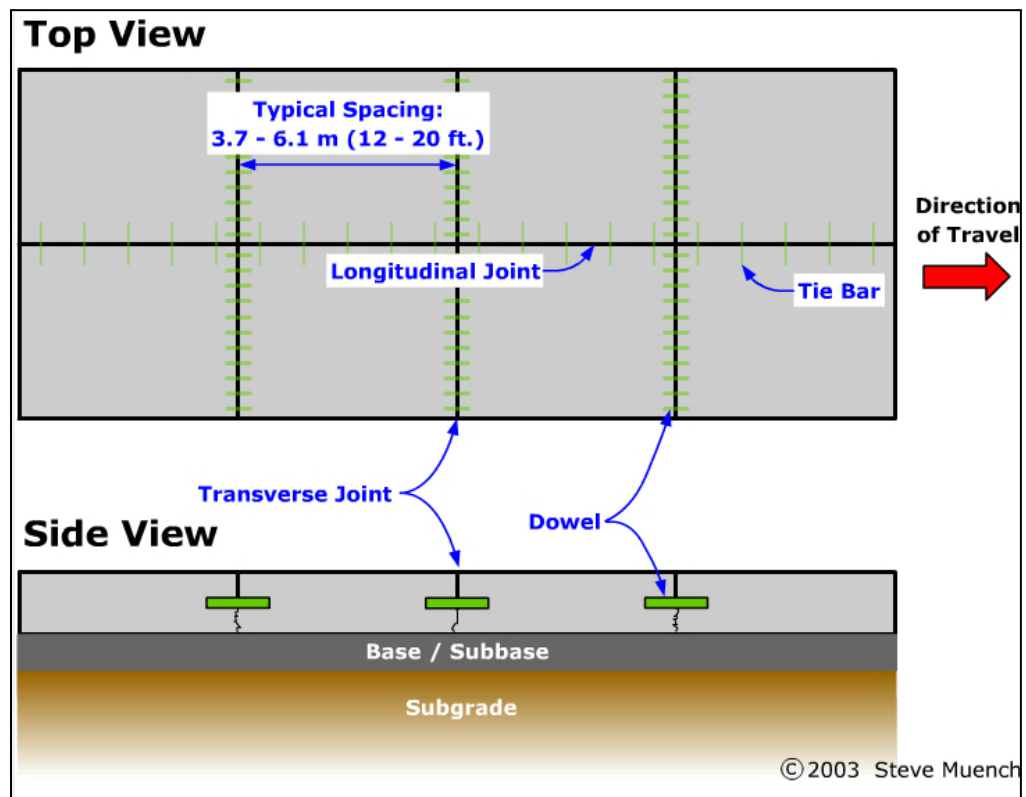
General Layout of a Jointed Plain Concrete (Rigid) Pavement
